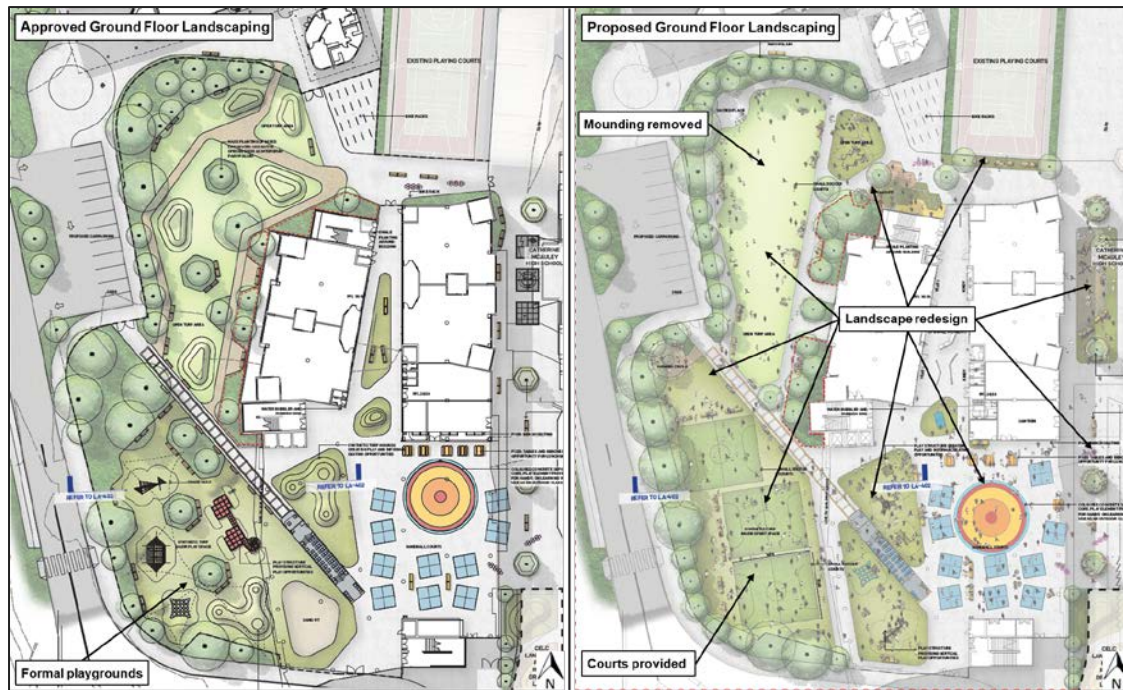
| Approved (left) and proposed (right) ground floor landscaping layout and design (Base source Applicant's RtS 2023)
